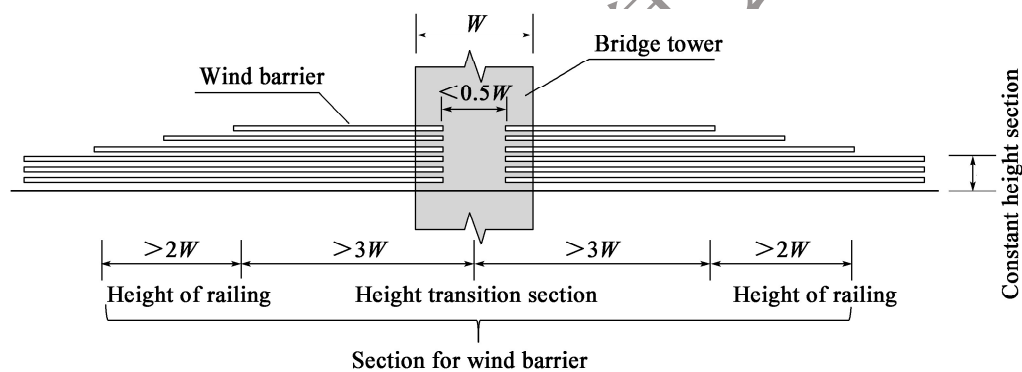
Schematic for arrangement of wind barrier at bridge tower
